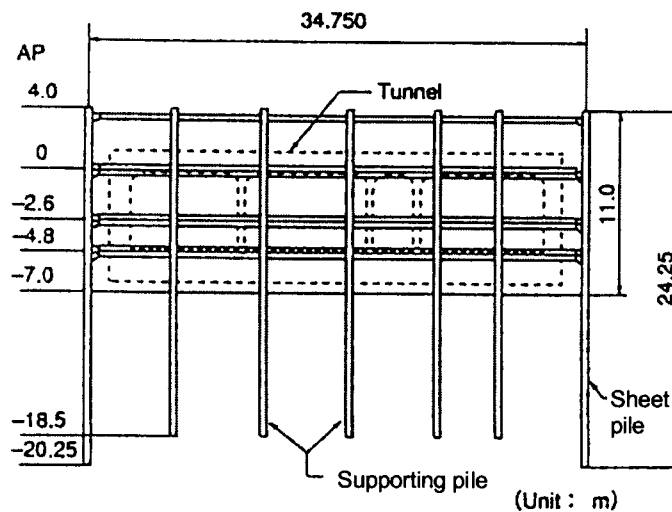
Typical cross section showing the bracing method (Tanaka et al. 1989)
